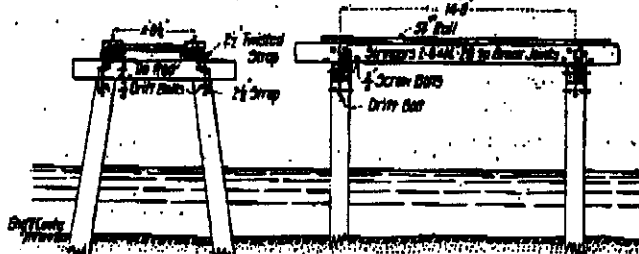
Trestle Used in Building South Jetty, Aransas Pass, Texas.
